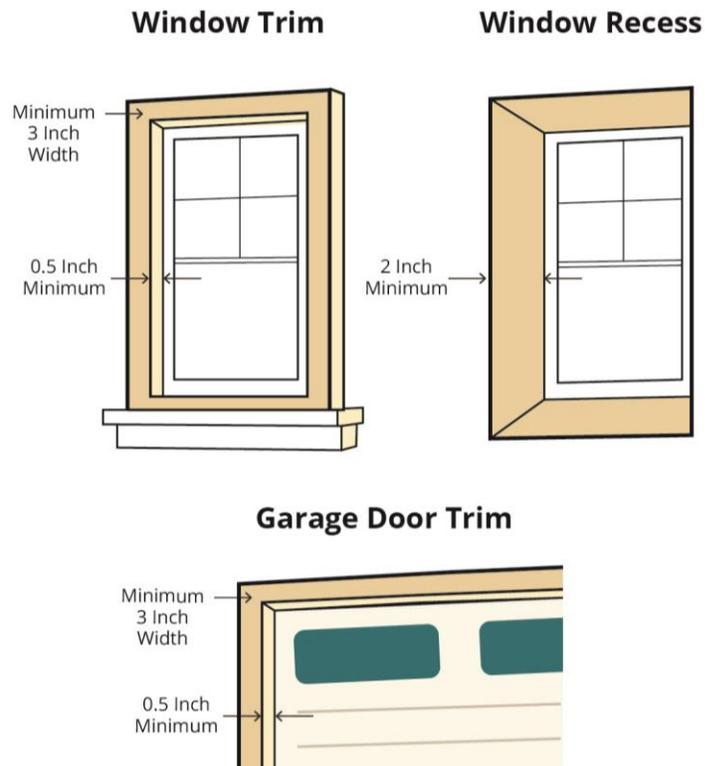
G MULTI-UNIT DWELLINGS, WINDOW AND GARAGE DOOR TRIM OR RECESS
